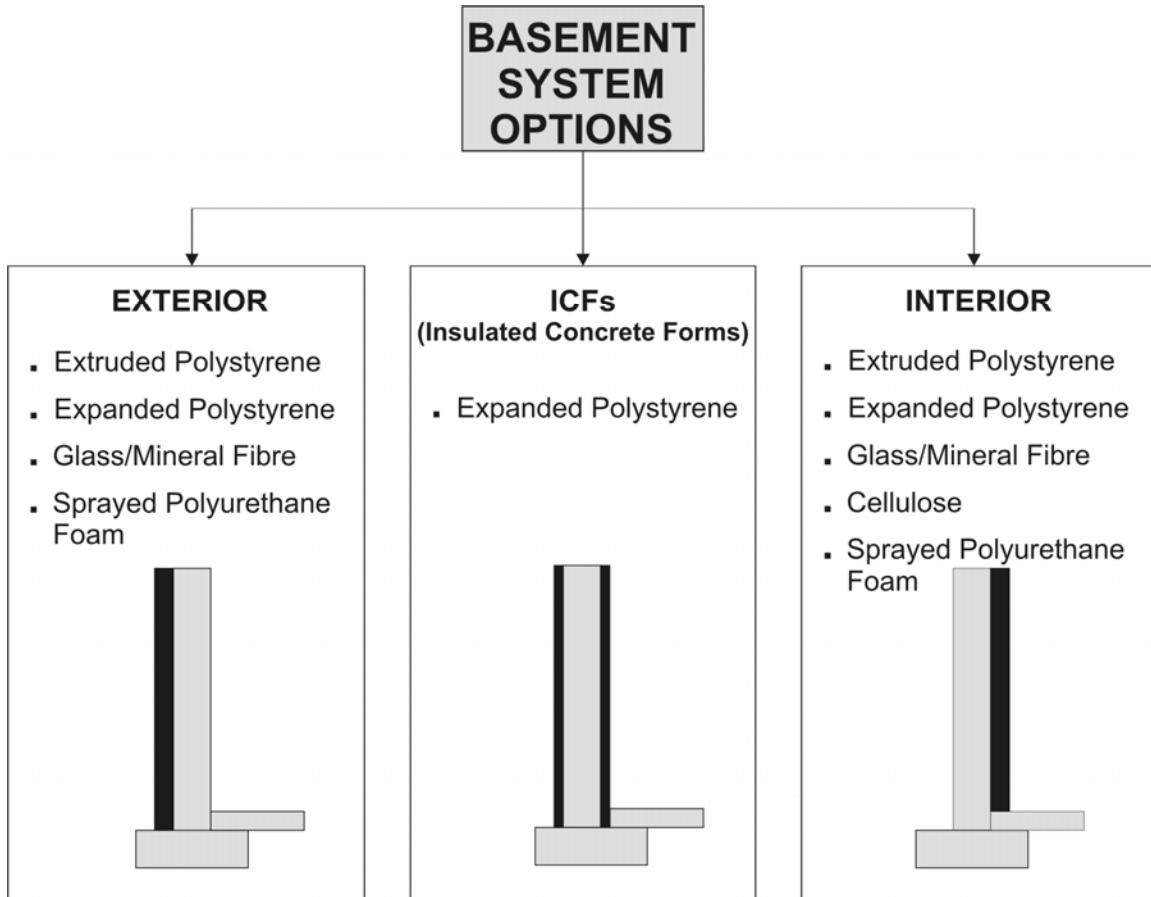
Basement system alternatives considered in the study based on thermal insulation placement.
